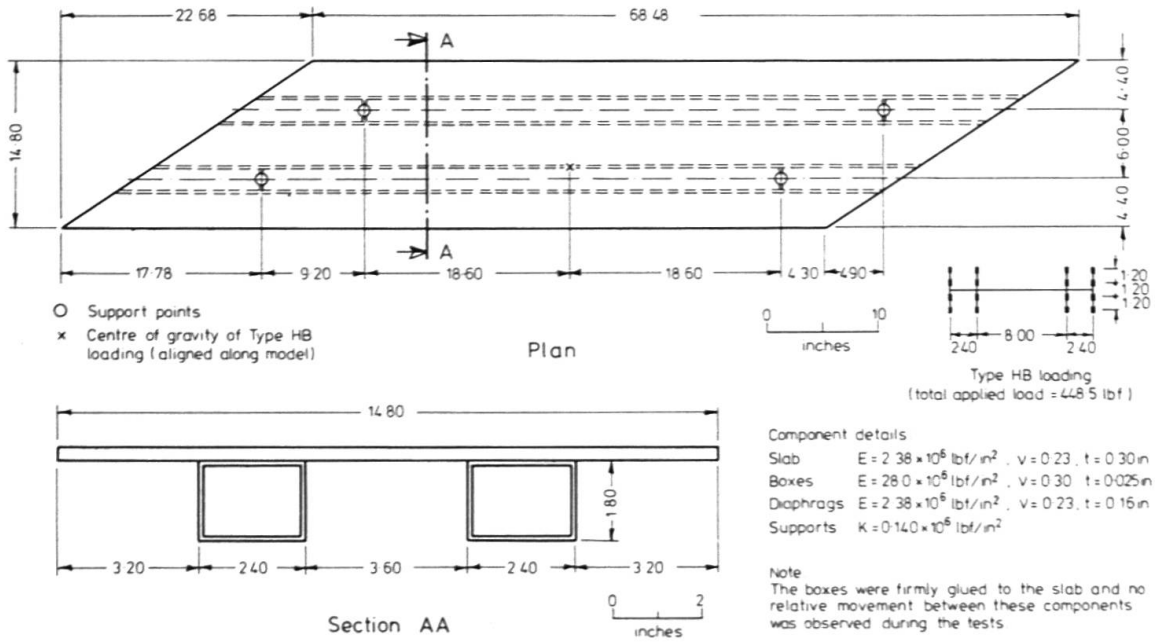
Composite twin cell box girder bridge model. Details of model and loading
